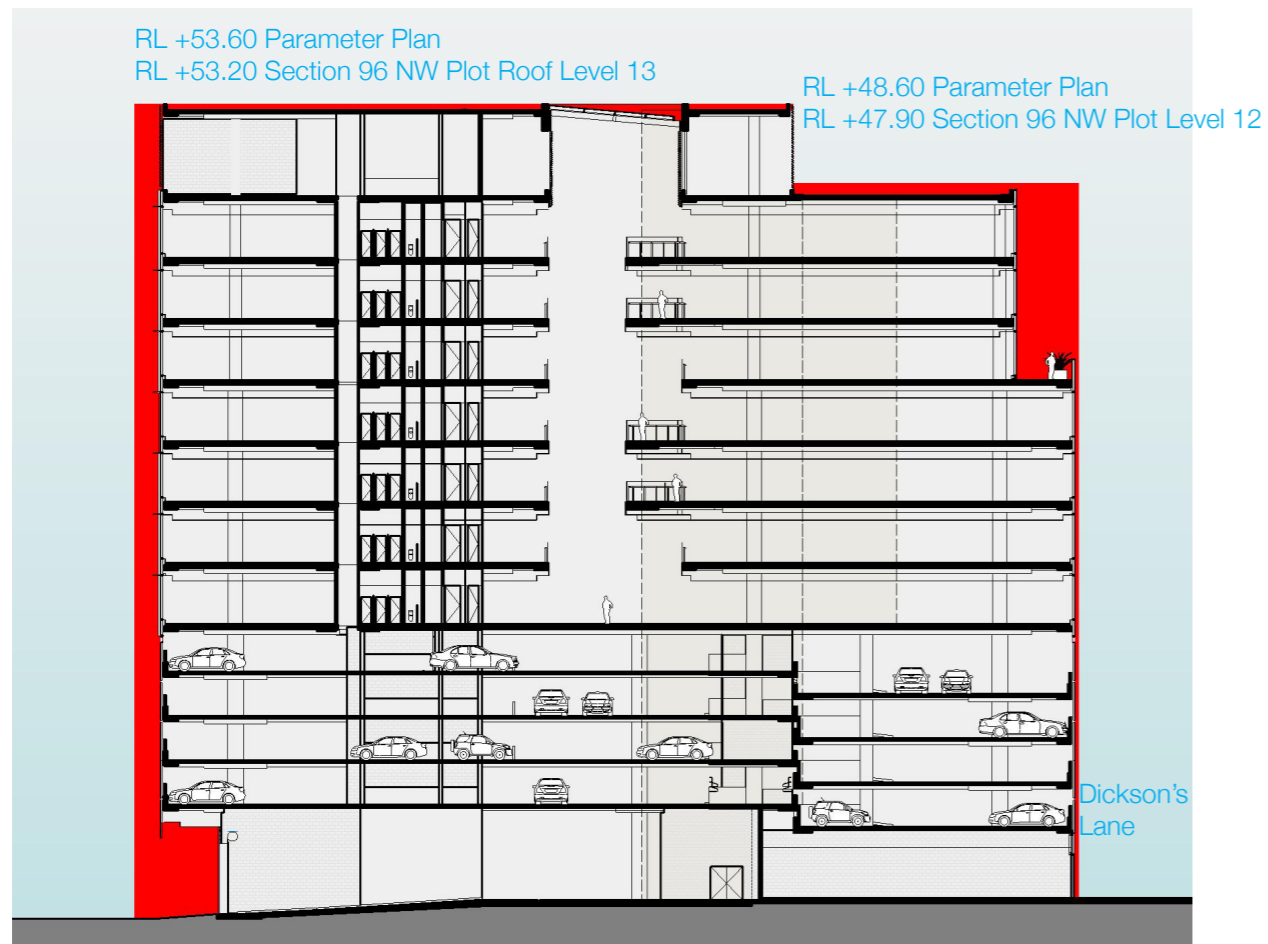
Section 96 NW Plot proposed building north south section with Parameter Plan envelope overlay
